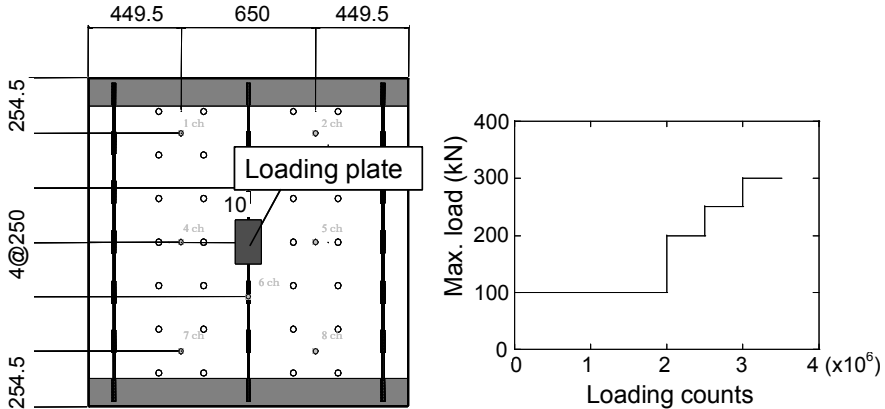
Steel-concrete slab specimen and fatigue loading steps.
